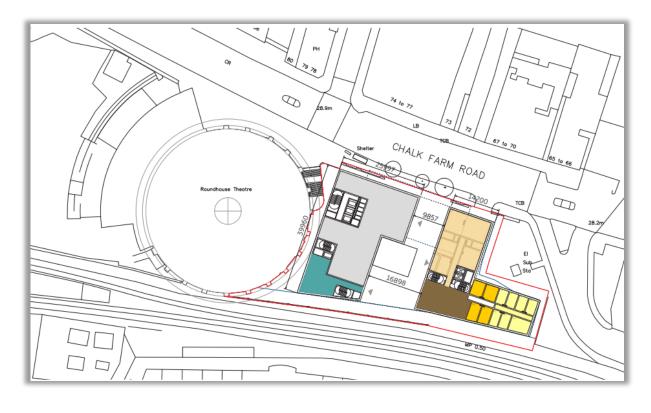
Site - Proposed Development - 100, Chalk Farm Road, Chalk Farm, London NW1 8EH
